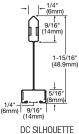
DETAILS AND SUSPENSION SYSTEM INTERSECTION
